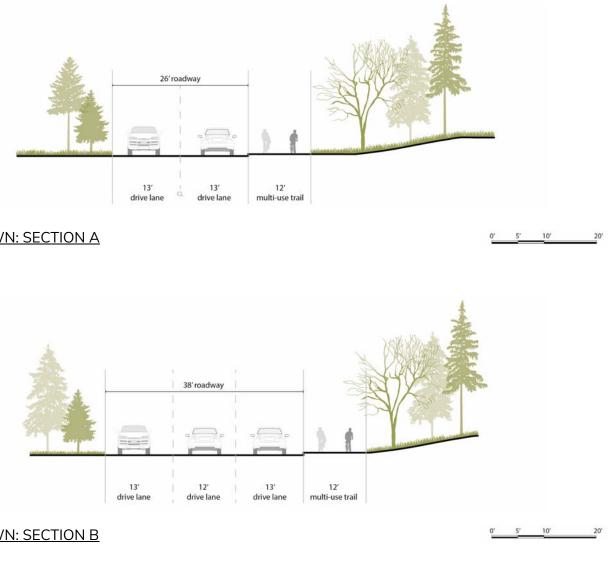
PRIMARY PRIVATE STREET ALTERNATIVES - TYPICAL STREET SECTIONS
